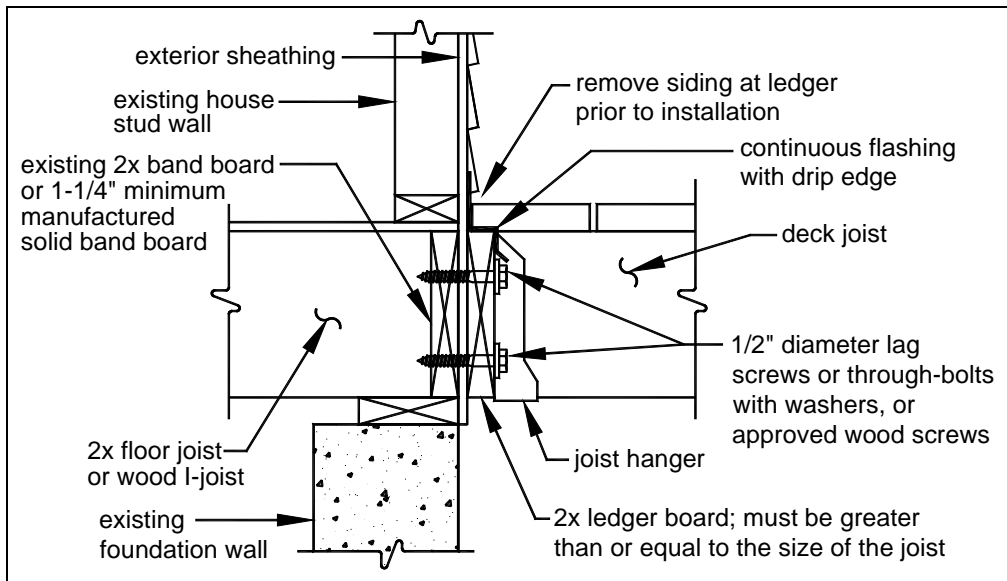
ATTACHMENT OF LEDGER BOARD-TO-BAND BOARD
